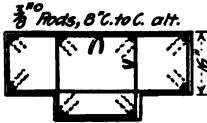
Wall Column, Twelve-Story Loft Building.
